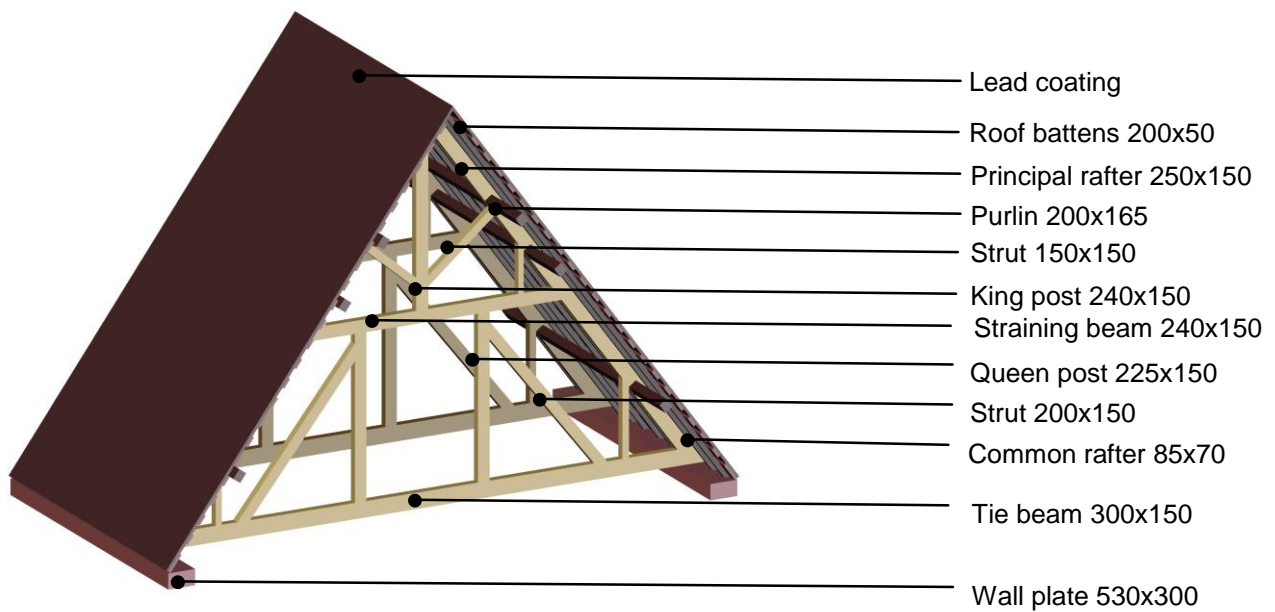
Structural parts of the roof framing in the nave of Canterbury Cathedral and section areas (millimeters).
